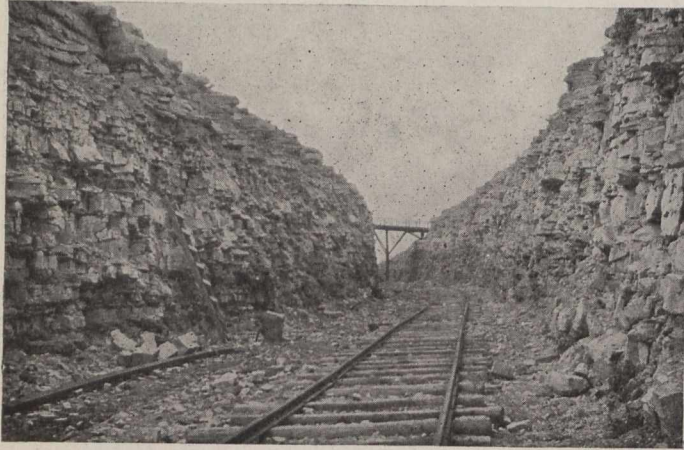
Rock-cut on G.T.R. Relocation, 3rd Curve. Thorold (Section 3).
